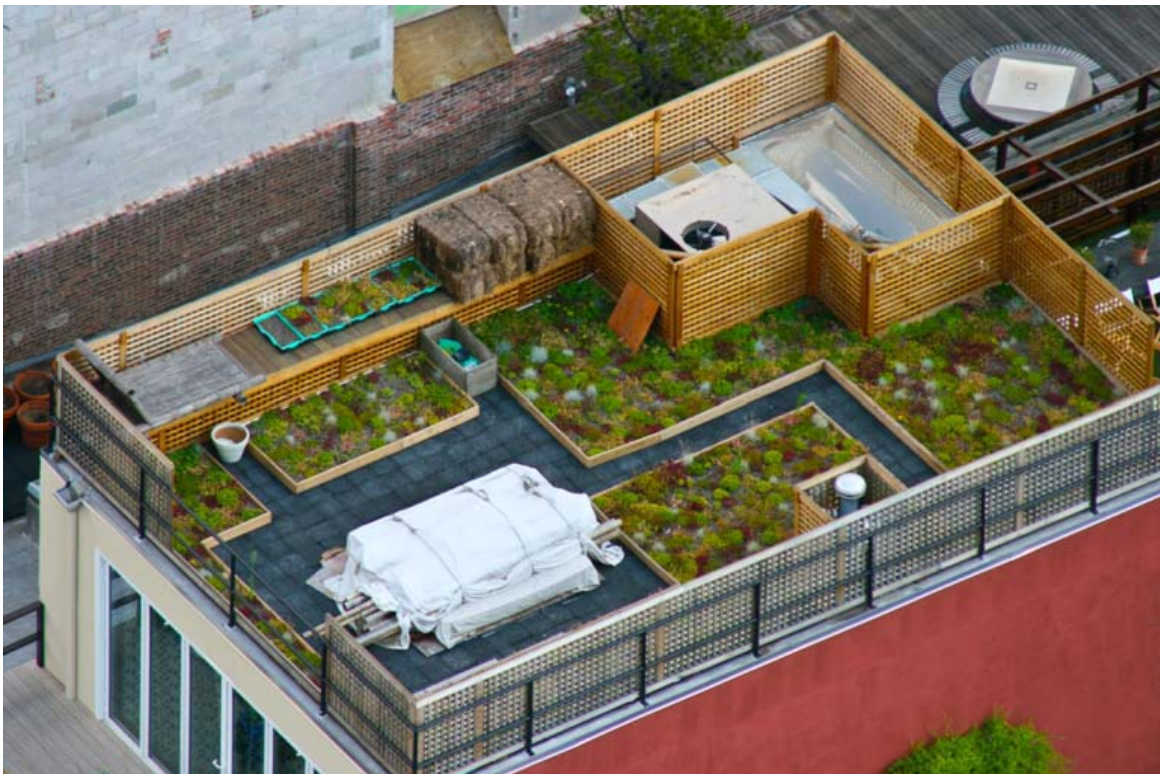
Rooftop farming (Photo by the Scientist Gardener)
